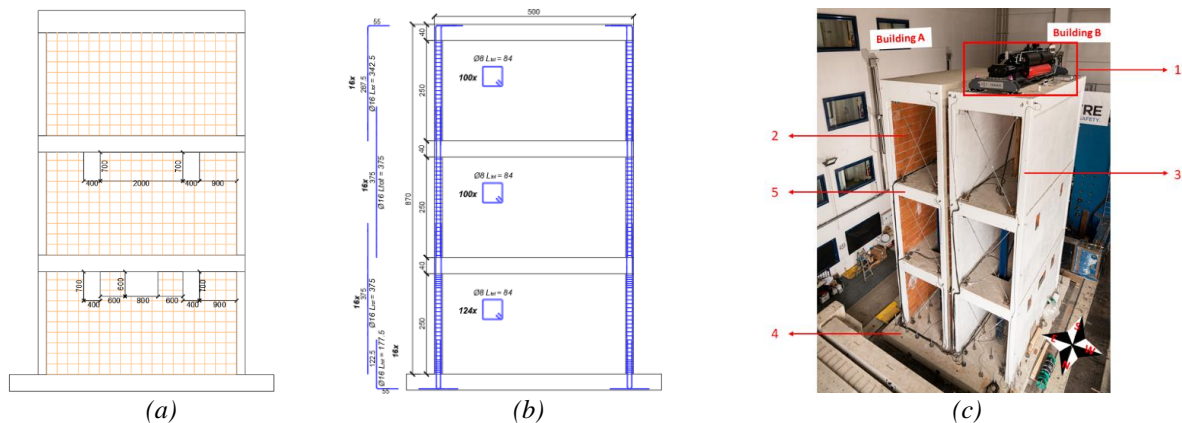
a) Elevation view of the buildings; b) Reinforcement details of the columns; (c) The buildings tested in the Eucentre laboratory: 1) AMD; 2) masonry infills; 3) columns; 4) foundation slab connected to the shake table; 5) floor slabs.
